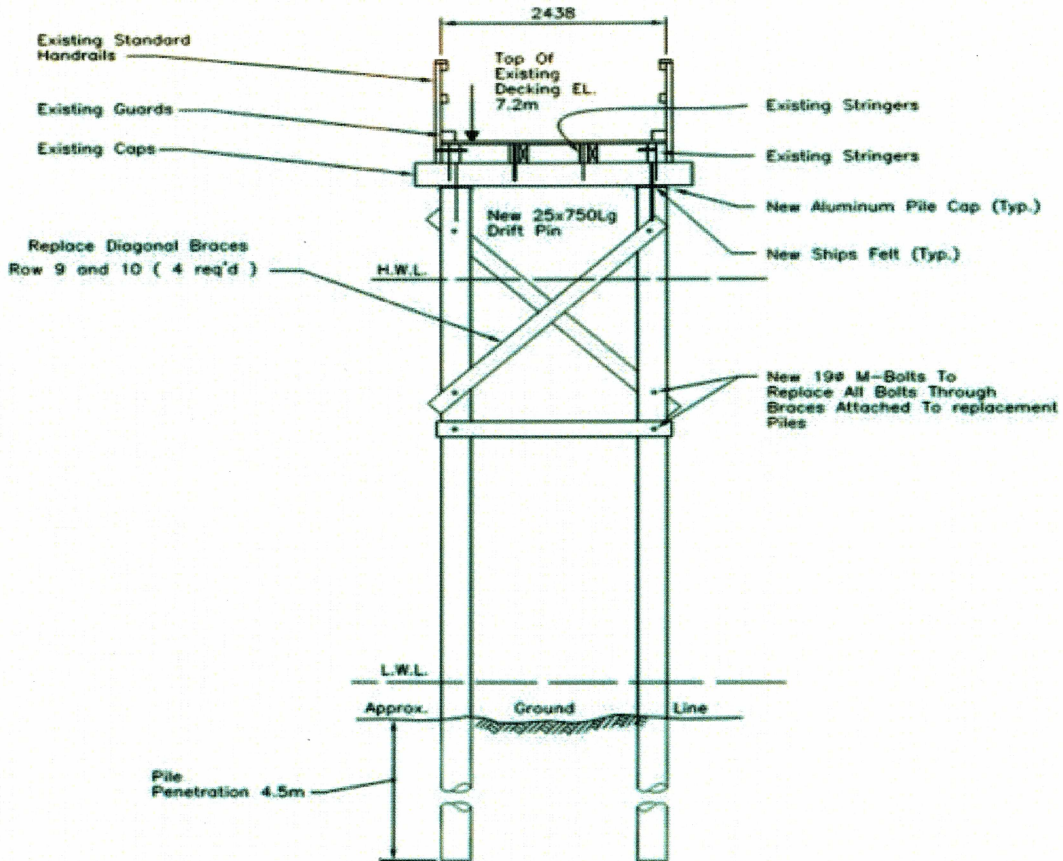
Typical Structure Cross Section (Abutment to Bent No. 13)
